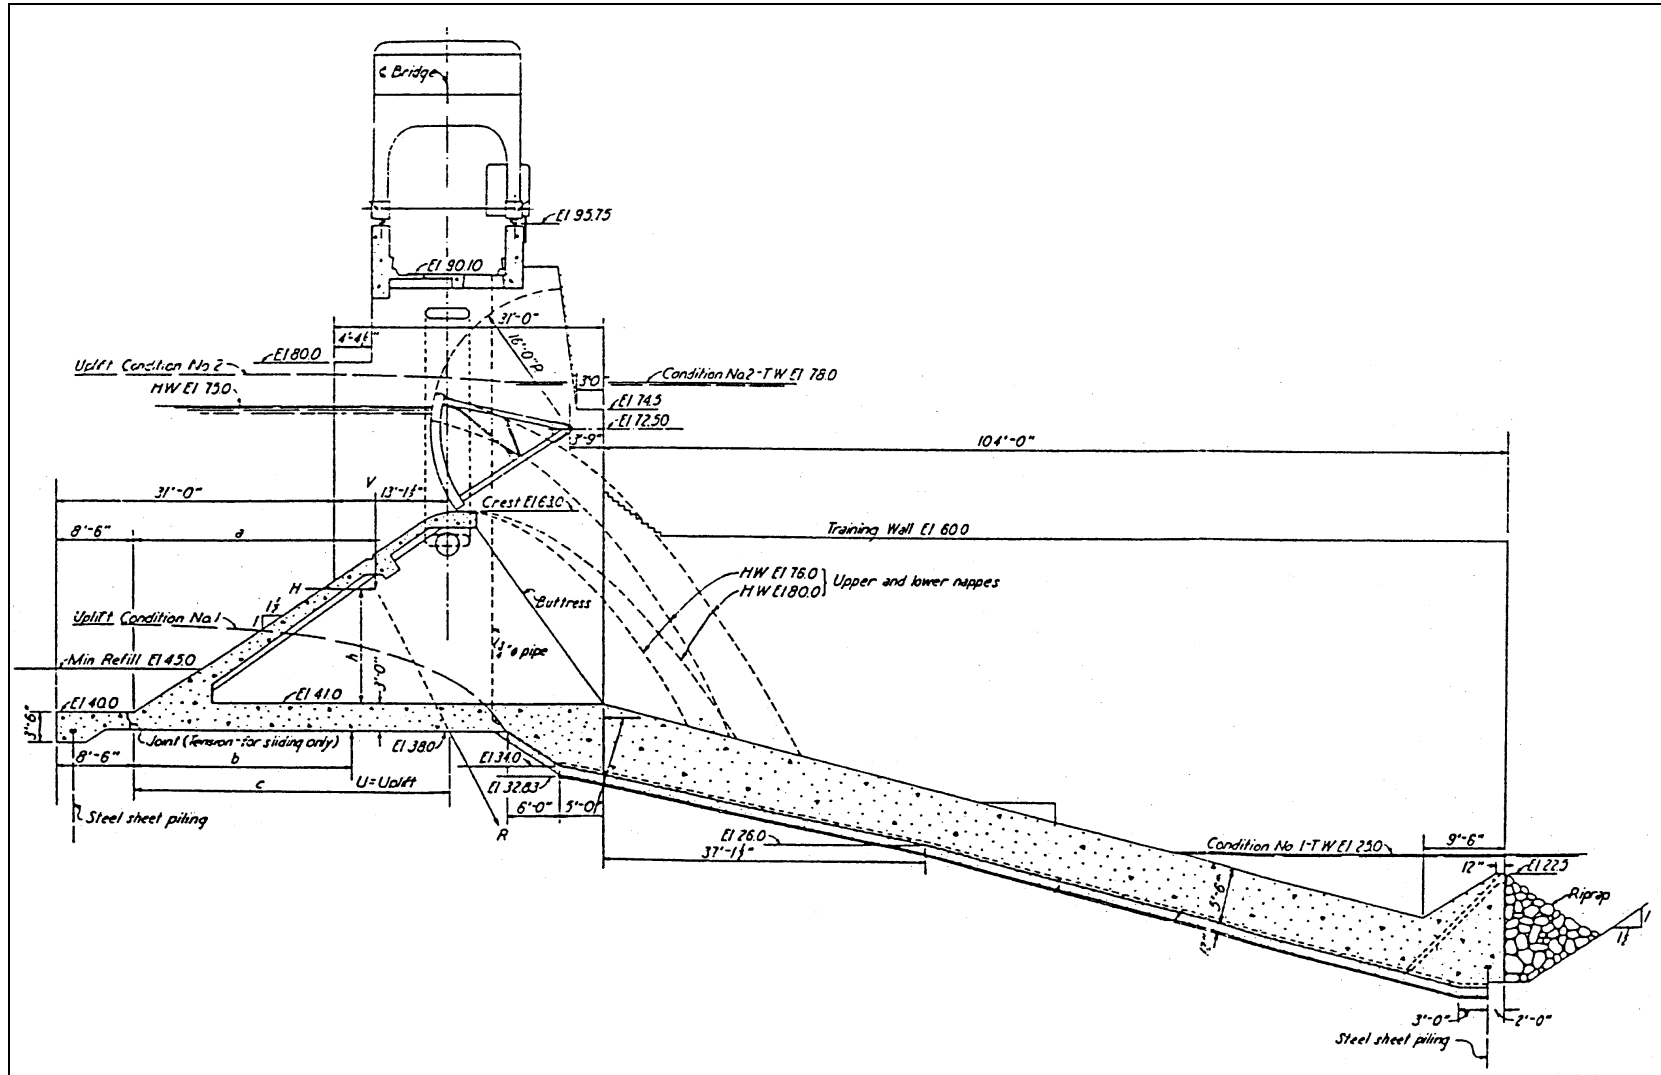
Section view of the Santee spillway. Drawing provided by Santee Cooper.
